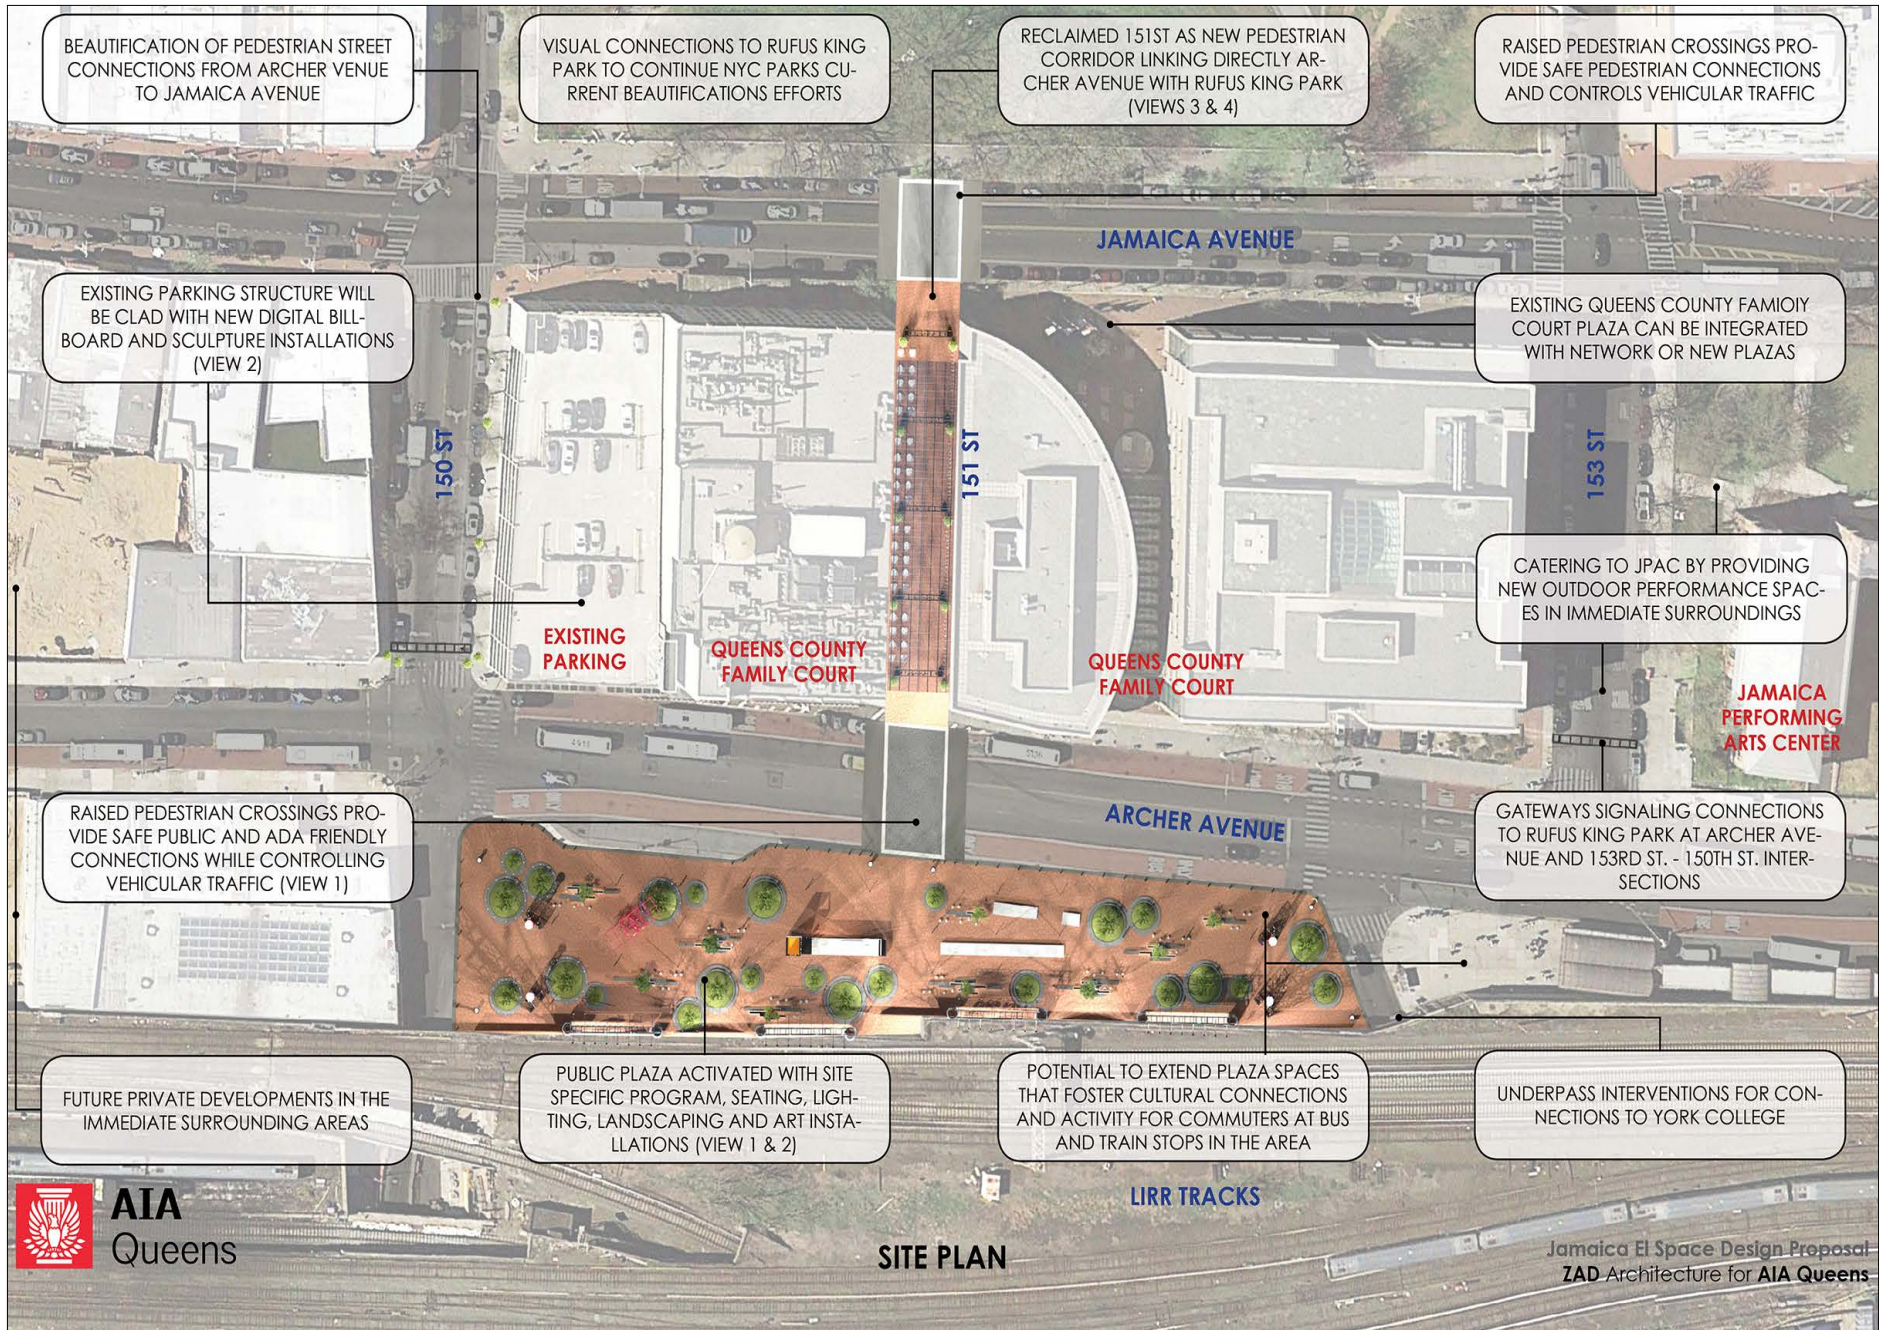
Streetscape Plan - Snapshot of Present Conditions
